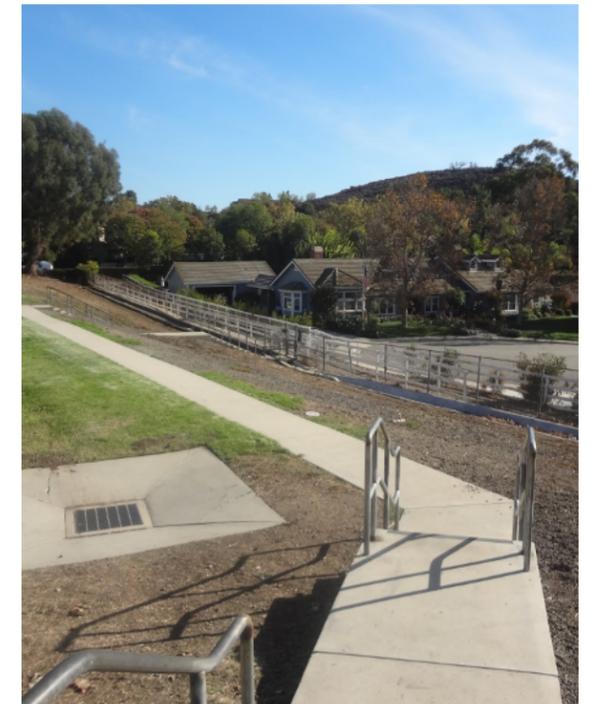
Secondary drop-off is not wheel chair accessible due to steps
